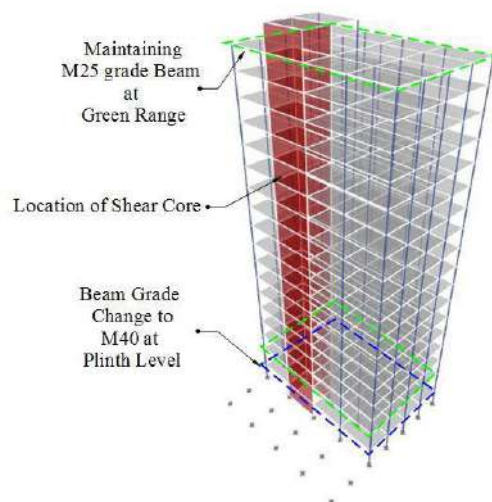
Beam Stability Case - Beams of different sizes (All M40 grade beams at plinth level): Case BS2
